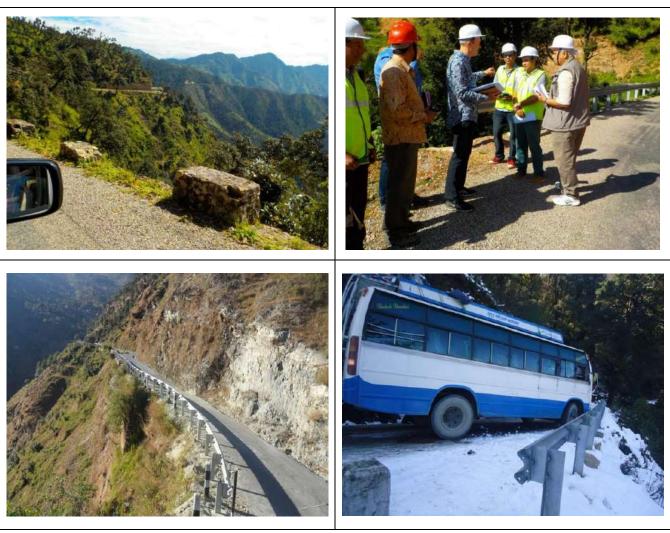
Roadside Barriers in Nepal. The GRSF funded construction of roadside barriers on cliff-side roads in Nepal, showing in order the road without barriers, during construction, at completion, as well as an example of a bus which was prevented from going over the cliff by the barrier
